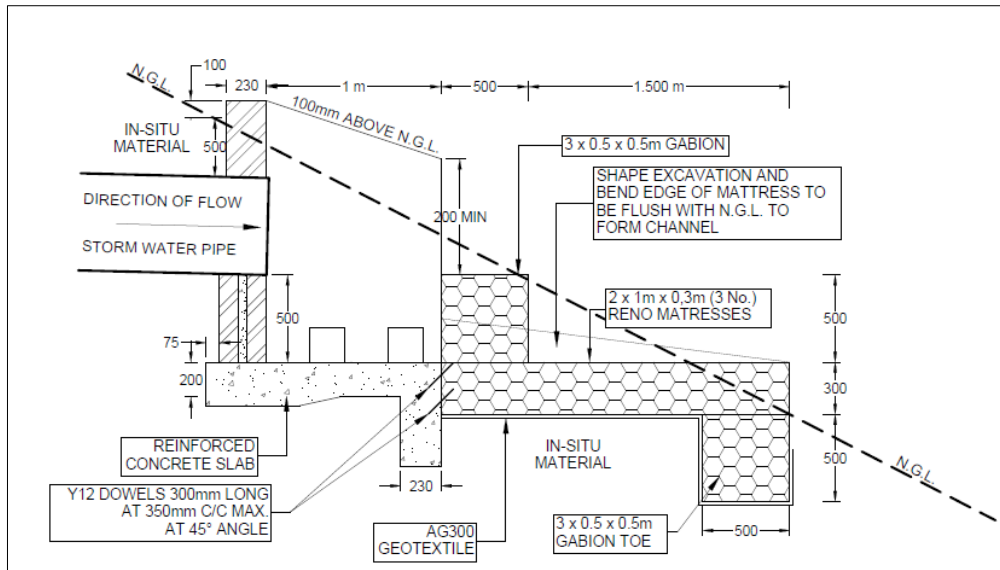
Section of proposed headwall outlets including stilling basins and erosion protection (Lyners, 2025).
